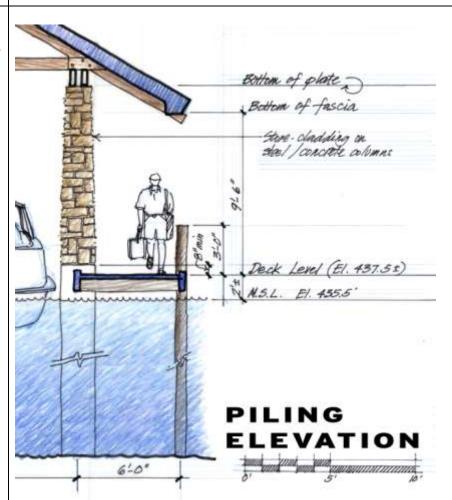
Boathouse – Visual measurements – Piling elevation
